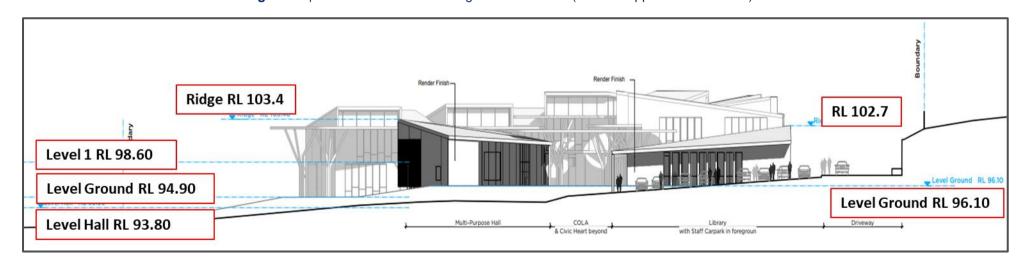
| Southern elevation (rear) (Source: Applicant's EIS 2018)
